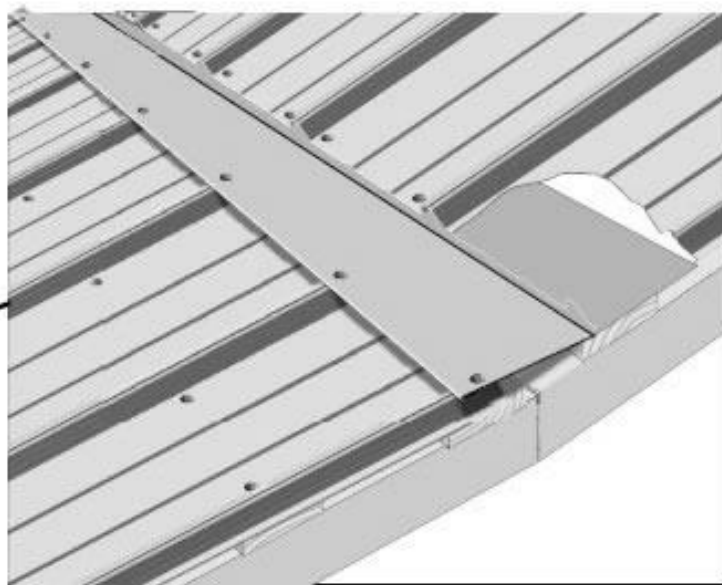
The transition flashing provides a continuous drainage where two slopes meet.
